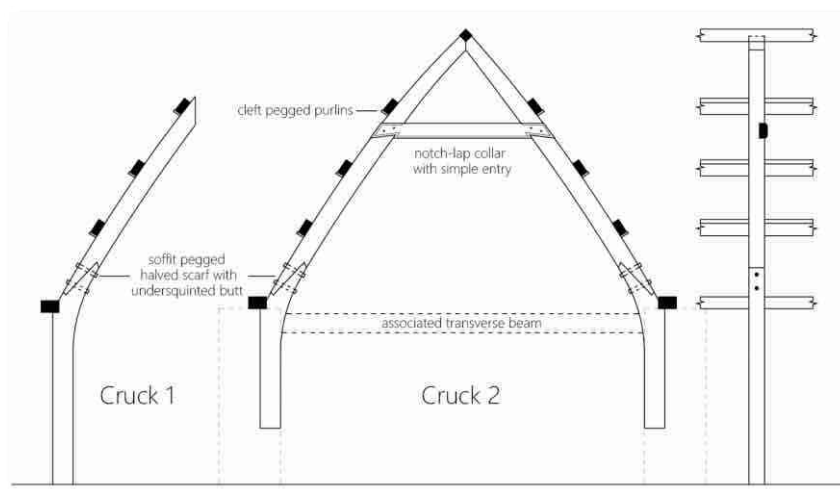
Crucks 1 (T1) and 2 (T2), including purlin, ridge and wall plate detail.
